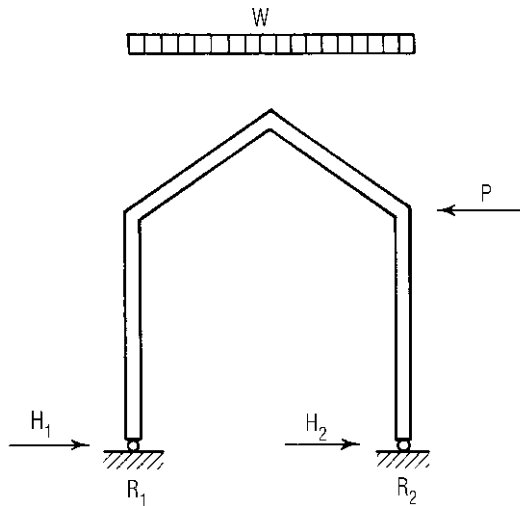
Gable frame with vertical columns and two sloping beams.
